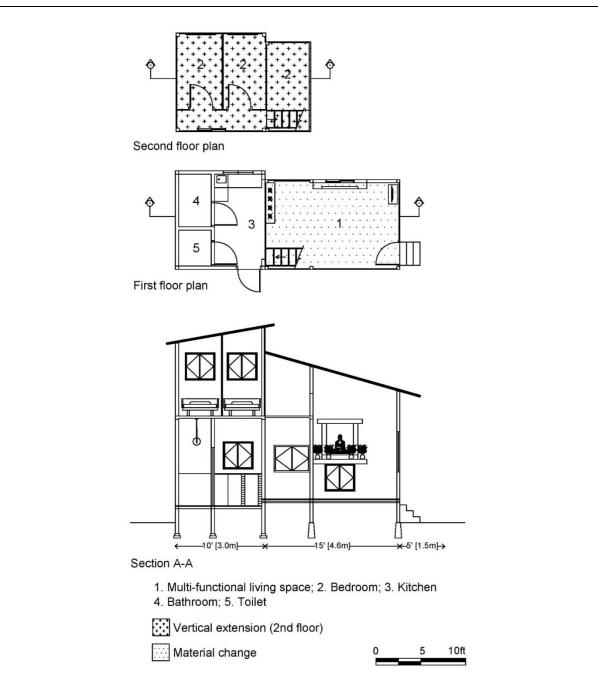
Addition of 2nd floor (House no.18 at Site 1)
